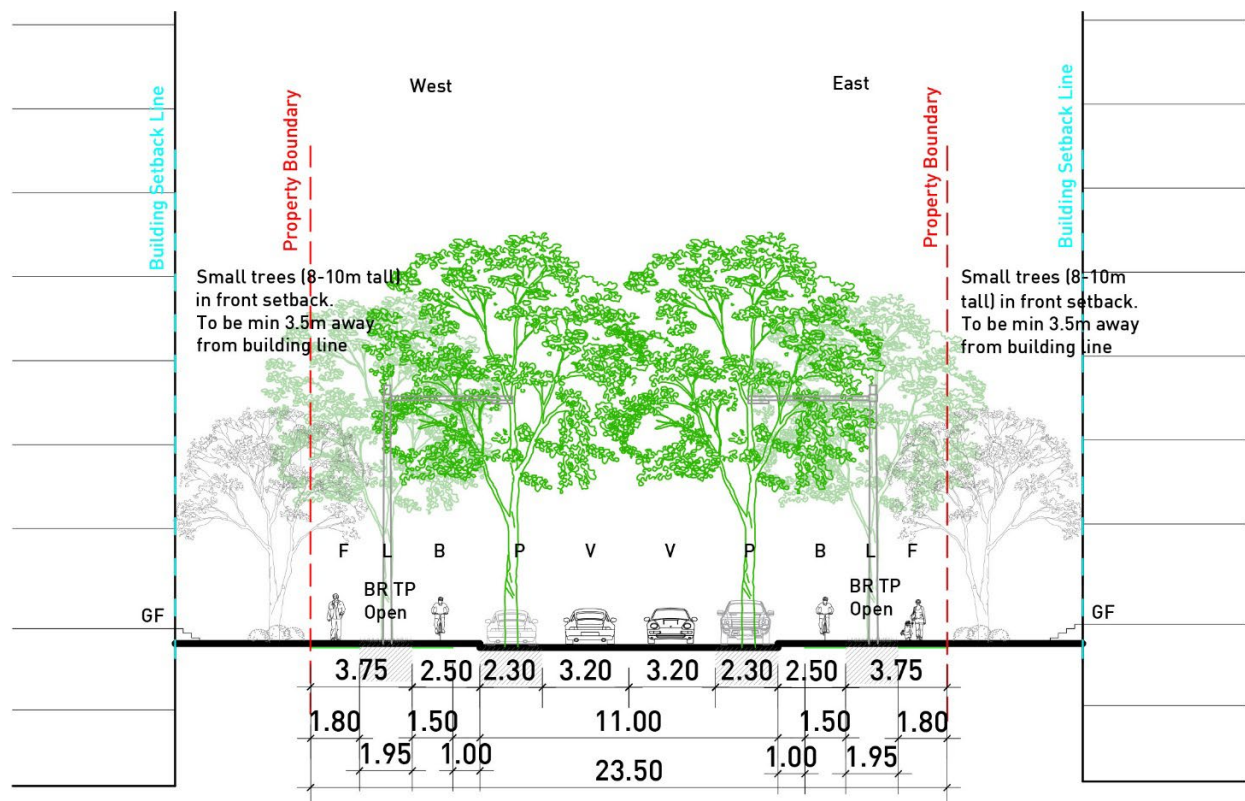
Type 2A Main Road with Cycle Tracks (NSR 3)
